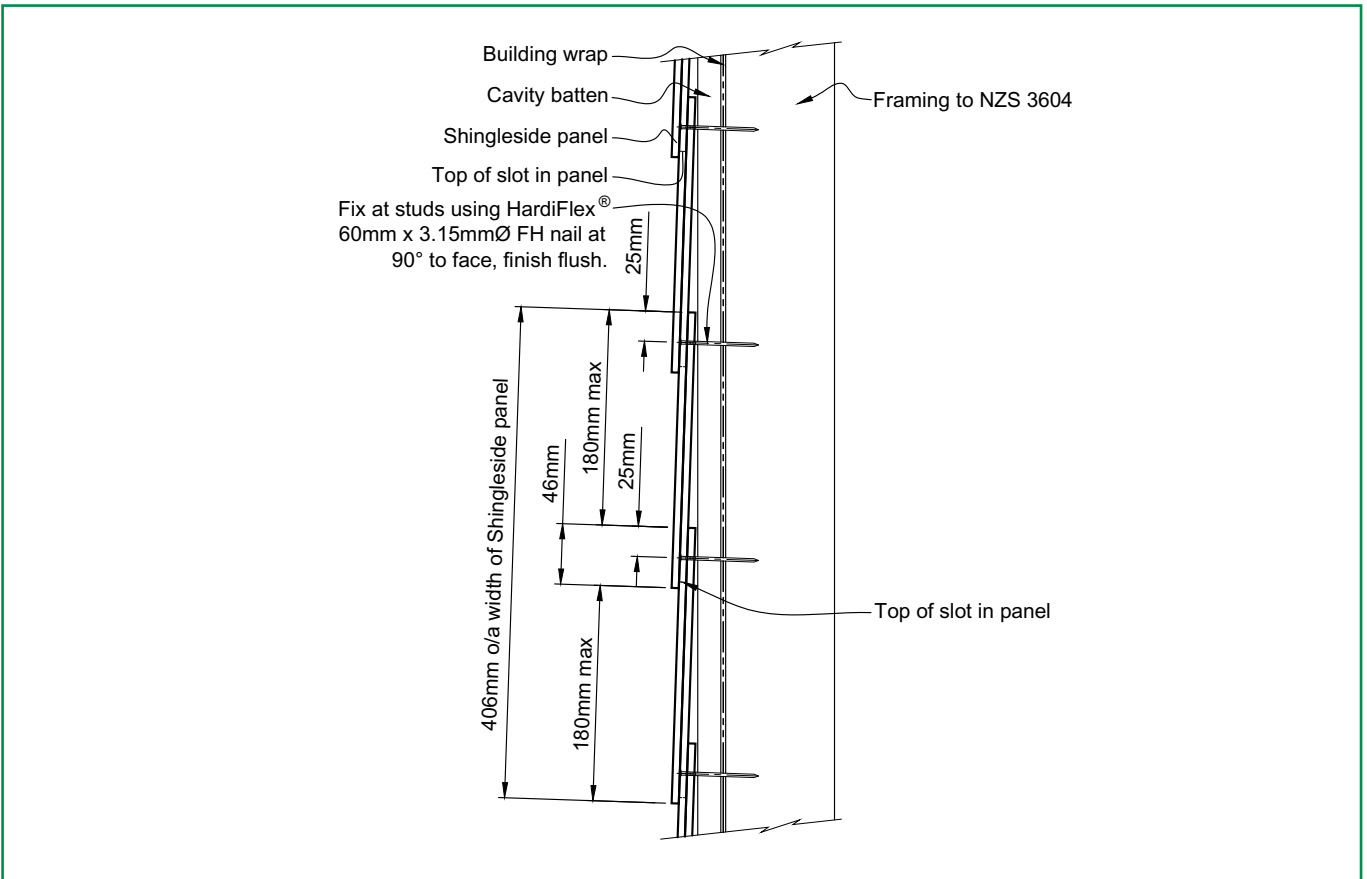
SHINGLESIDE STRAIGHT EDGE PANEL FIXING
